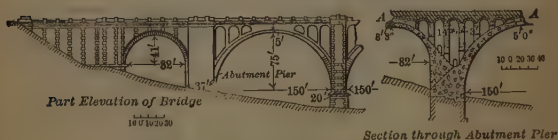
Connecticut Ave. Bridge, Washington, D. C.
